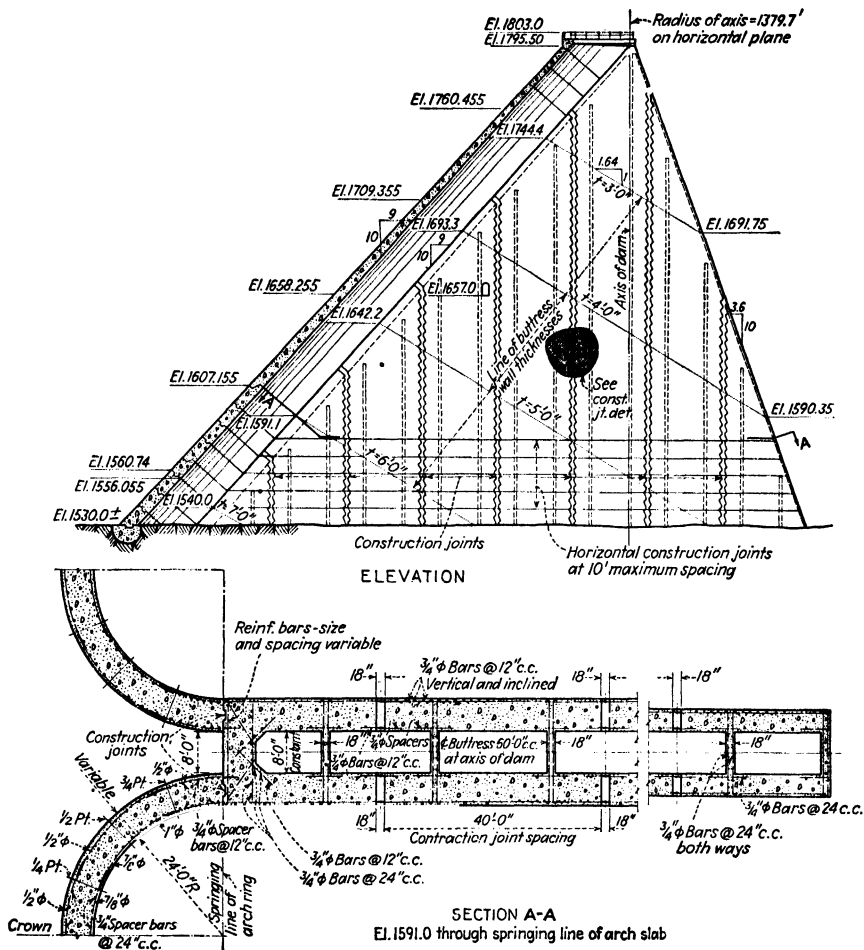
Bartlett Dam. Bulkhead buttress and sections (inclined faces in vertical joints).
